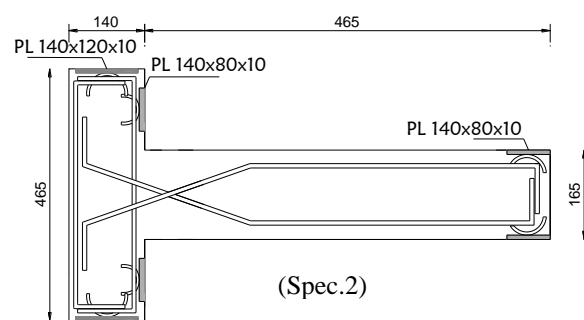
The SPECIMEN WITH CROSSED LONGITUDINAL BARS
